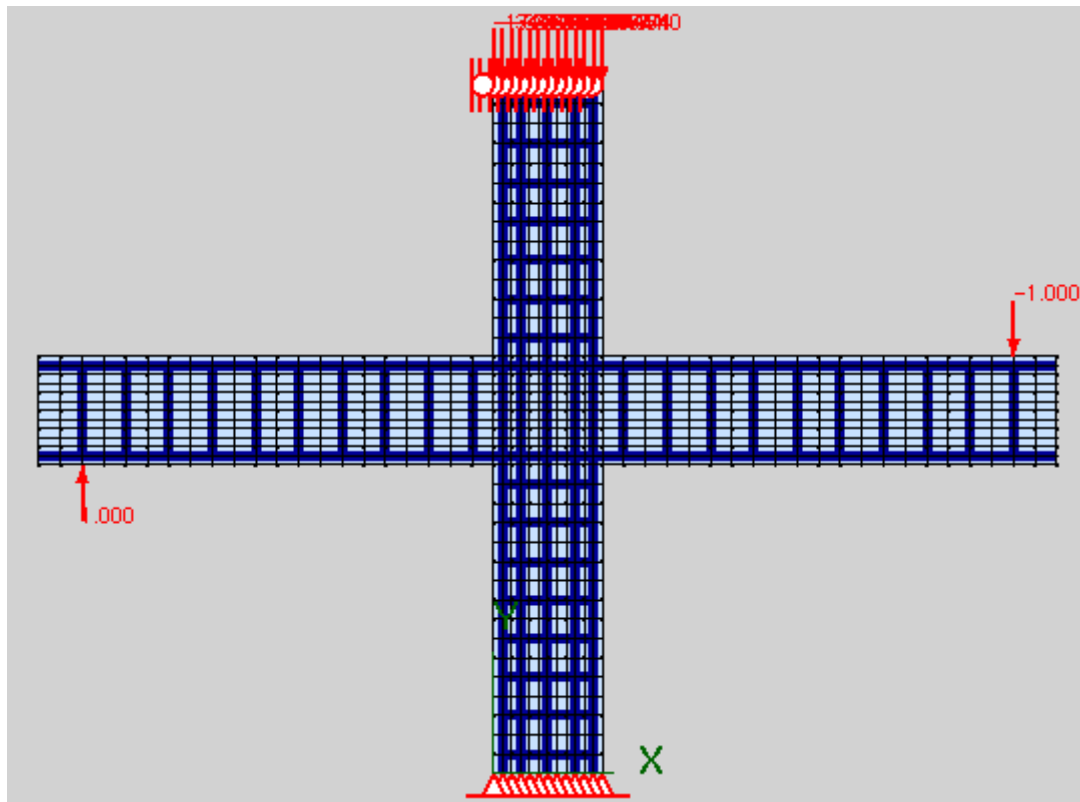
Interior Joint Model in VecTor2 after Column Jacketing
